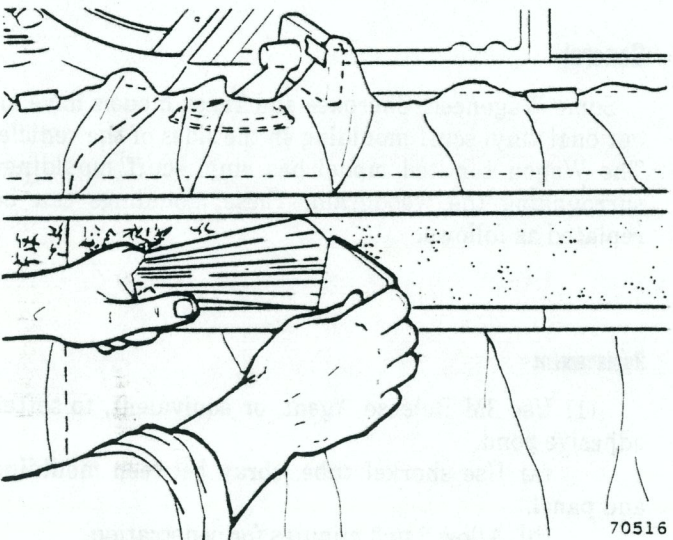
P-13 Using Squeegee to Assist in Removal of Overlay
